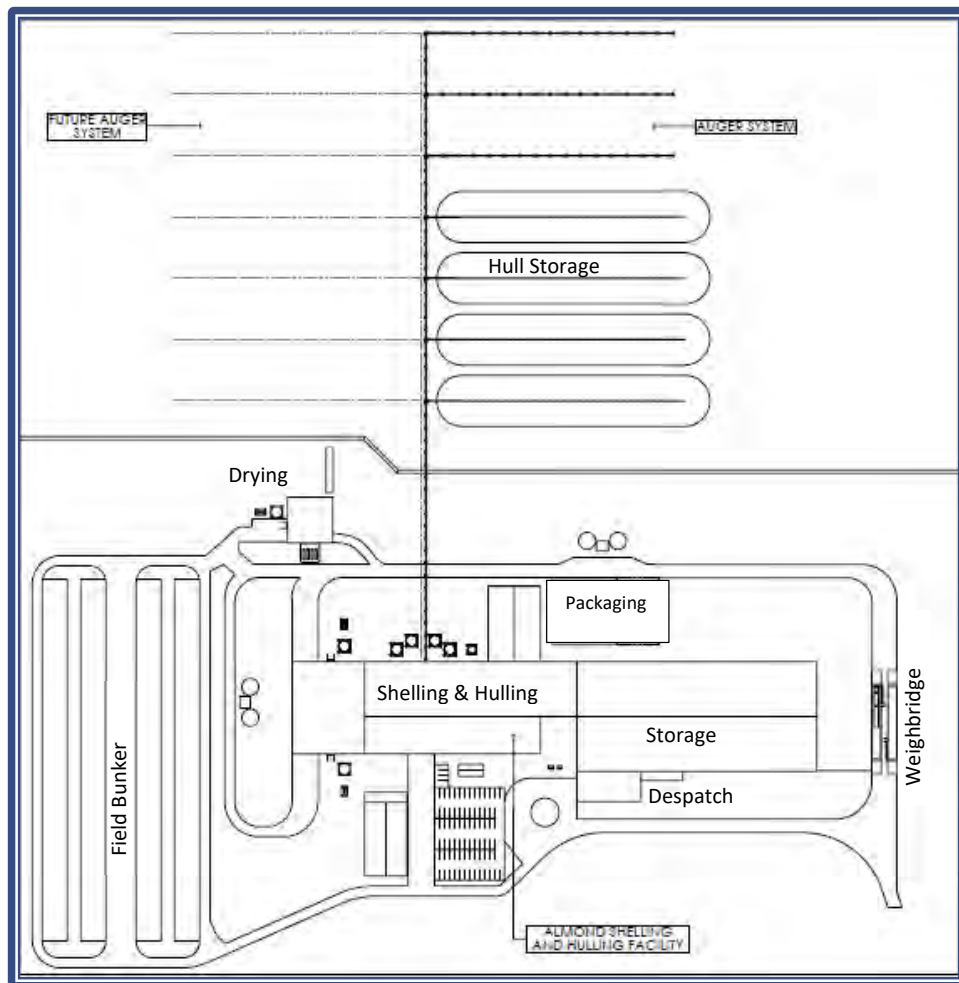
Image identifying proposed hulling and shelling facility layout (Source: JMA Plans sheet A102)
